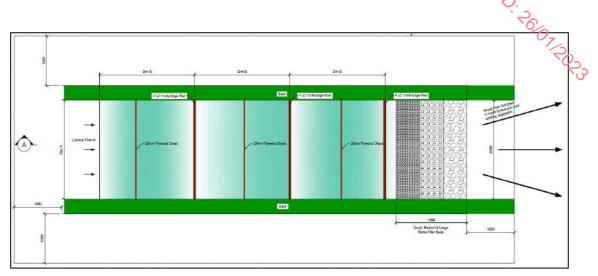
Plan View of Settlement Ponds (with Discharge to Drains where Applicable)
